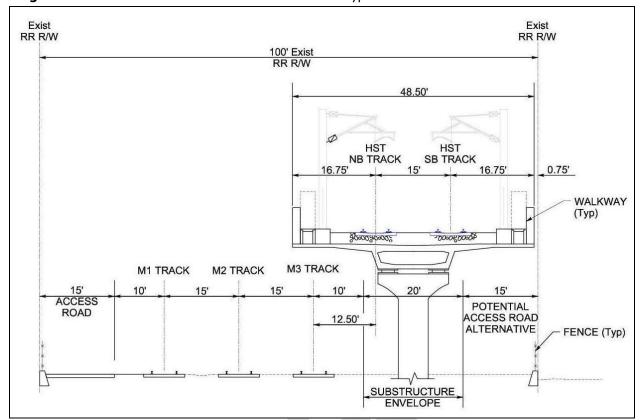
Consolidated Shared-Track Alternative – Typical Cross-Section – Hobart Yard to Fullerton
